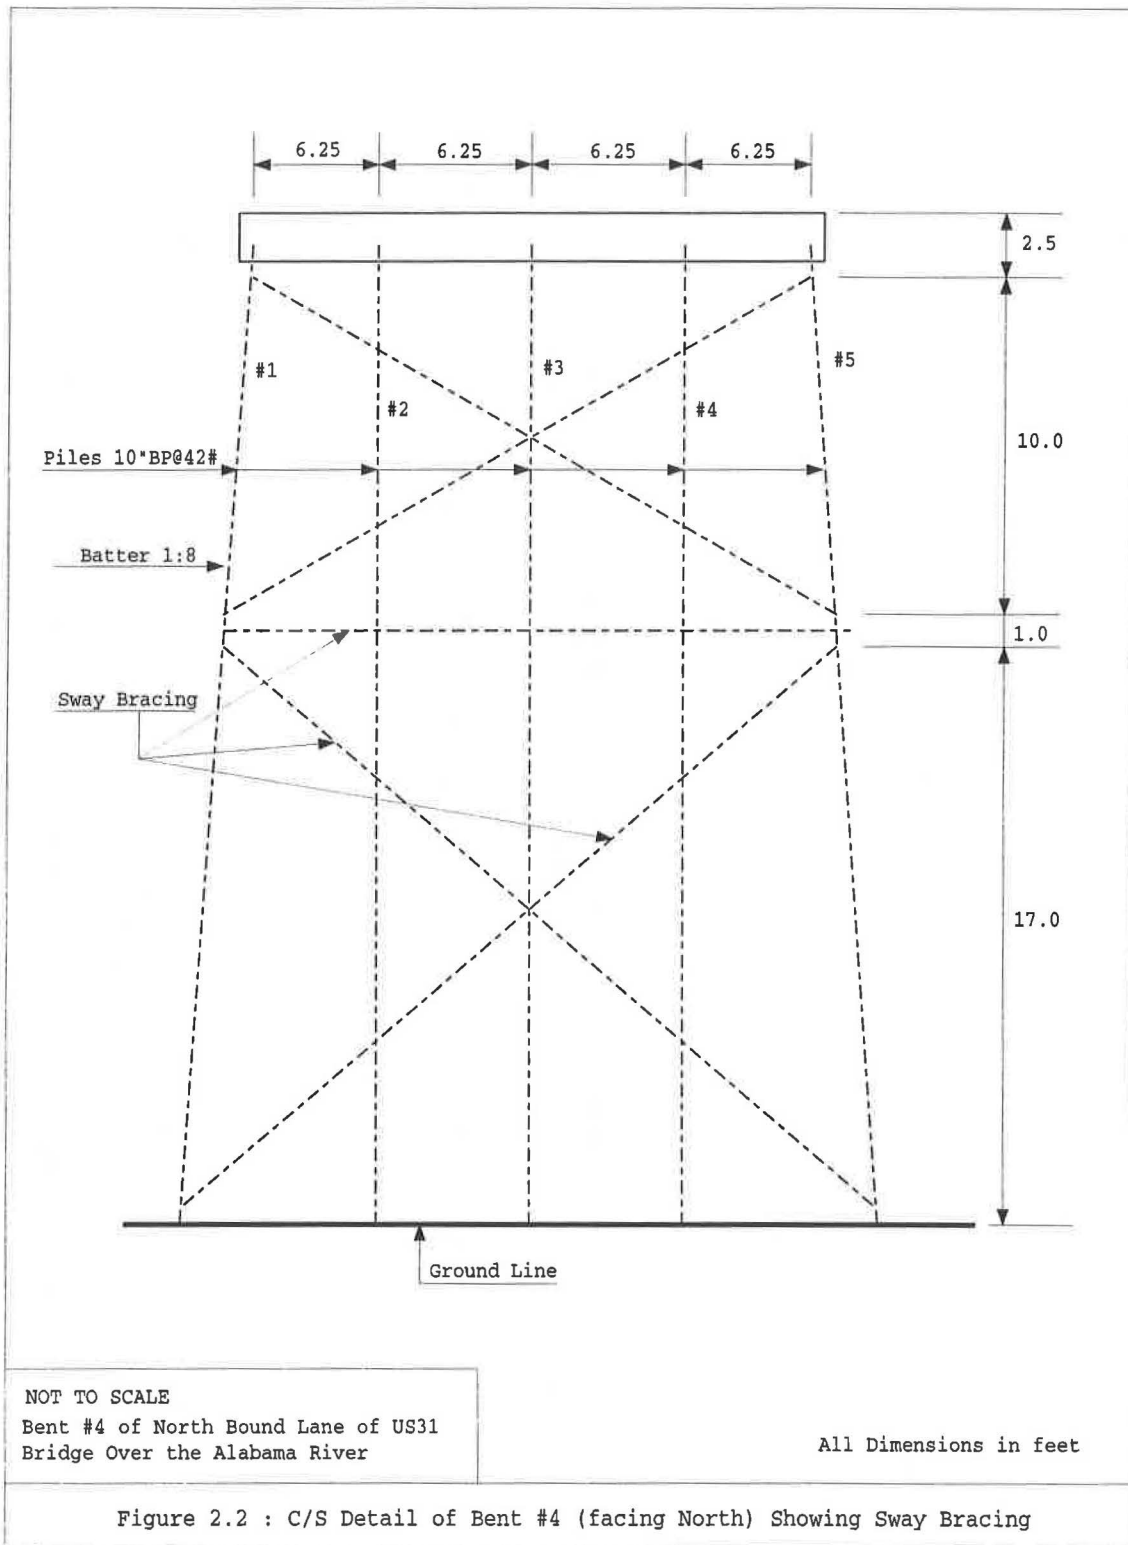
provides a schematic diagram of the structural elevation at Bent #4 (facing North), with piles being numbered 1 through 5 from left to right. A two-story sway-bracing system used to provide additional stiffness has also been included in the same figure. At the top, the piles are connected directly to the concrete structural member comprising the Bent. At the ground level, the piles are encased in concrete (1.25 × 1.25 feet square) for a total depth of 5 ft. (2 ft above and 3 ft below the existing ground line). Figure 2.3 shows the plan view of the same bent.
